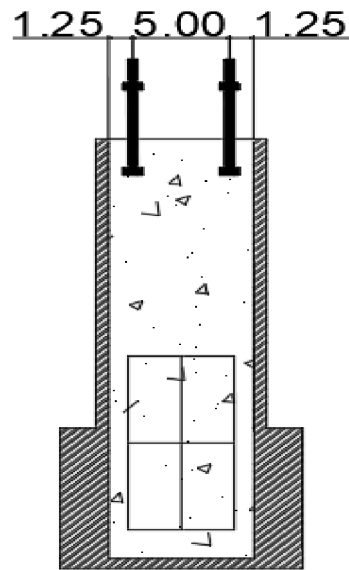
Specimen Sections (9-9), all dimensions in inch.
